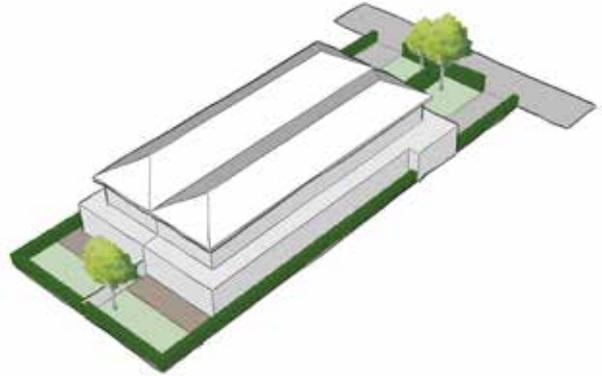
Typical dual occupancy constructed without the new 35% minimum garden area requirement
